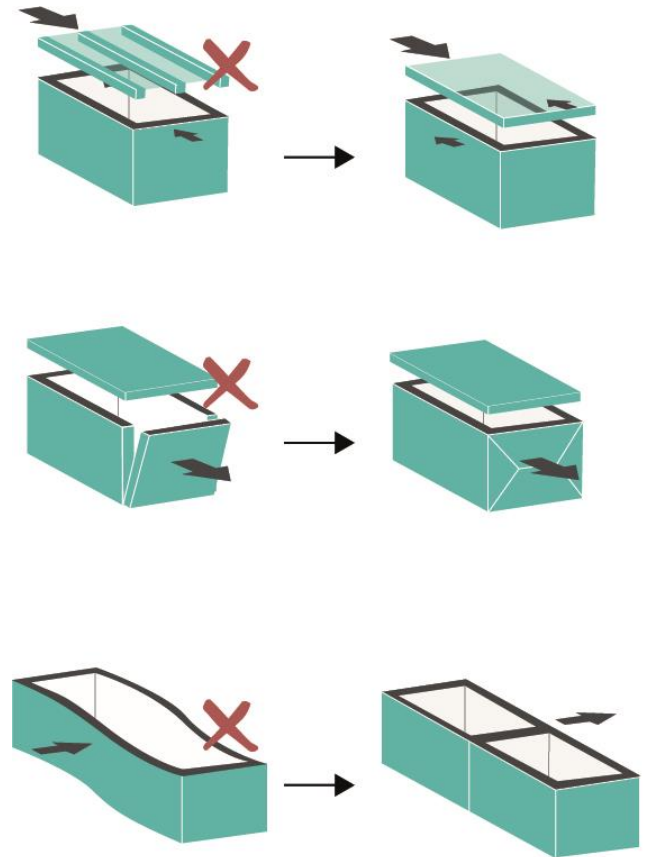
Stiff diaphragms provide a better load transfer (Adapted from Arup, 2014).
